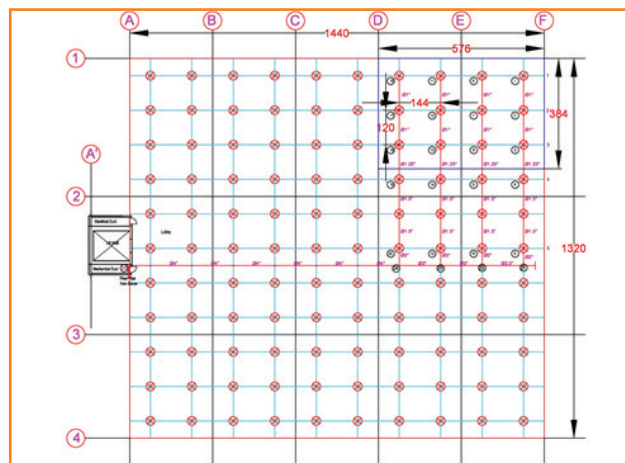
Floor Layout and Schematic Drawing, with Automatic Fire Sprinkler System
